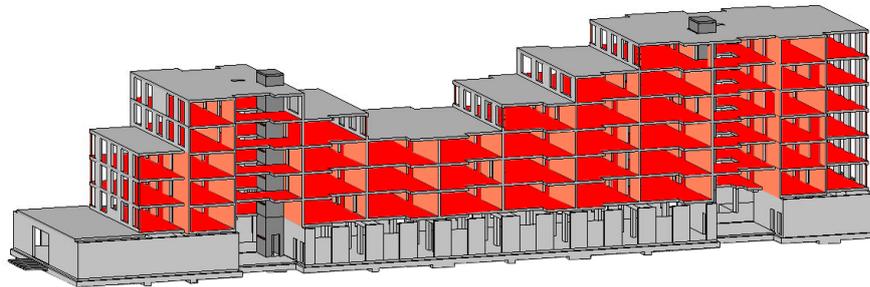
Concrete Floors and Walls to CLT Floors and Walls in Design Variant 3
